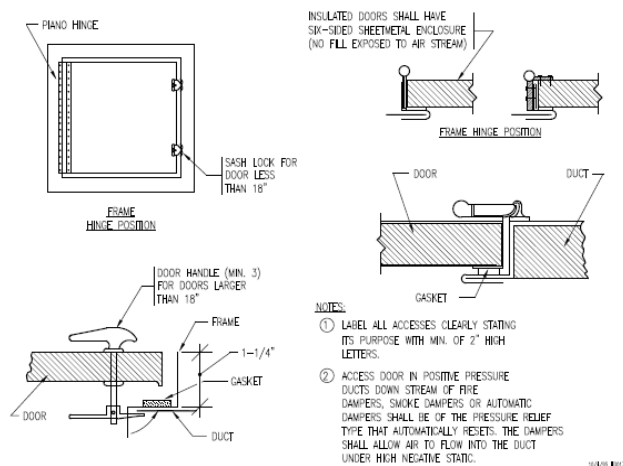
Duct Access Doors Detail (courtesy BR+A)
